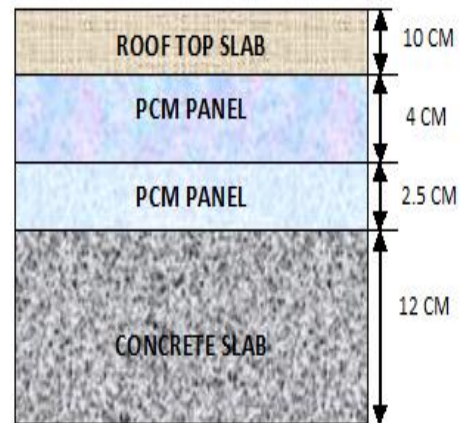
Concrete slab with rooftop finish piece with Double layer PCM.
